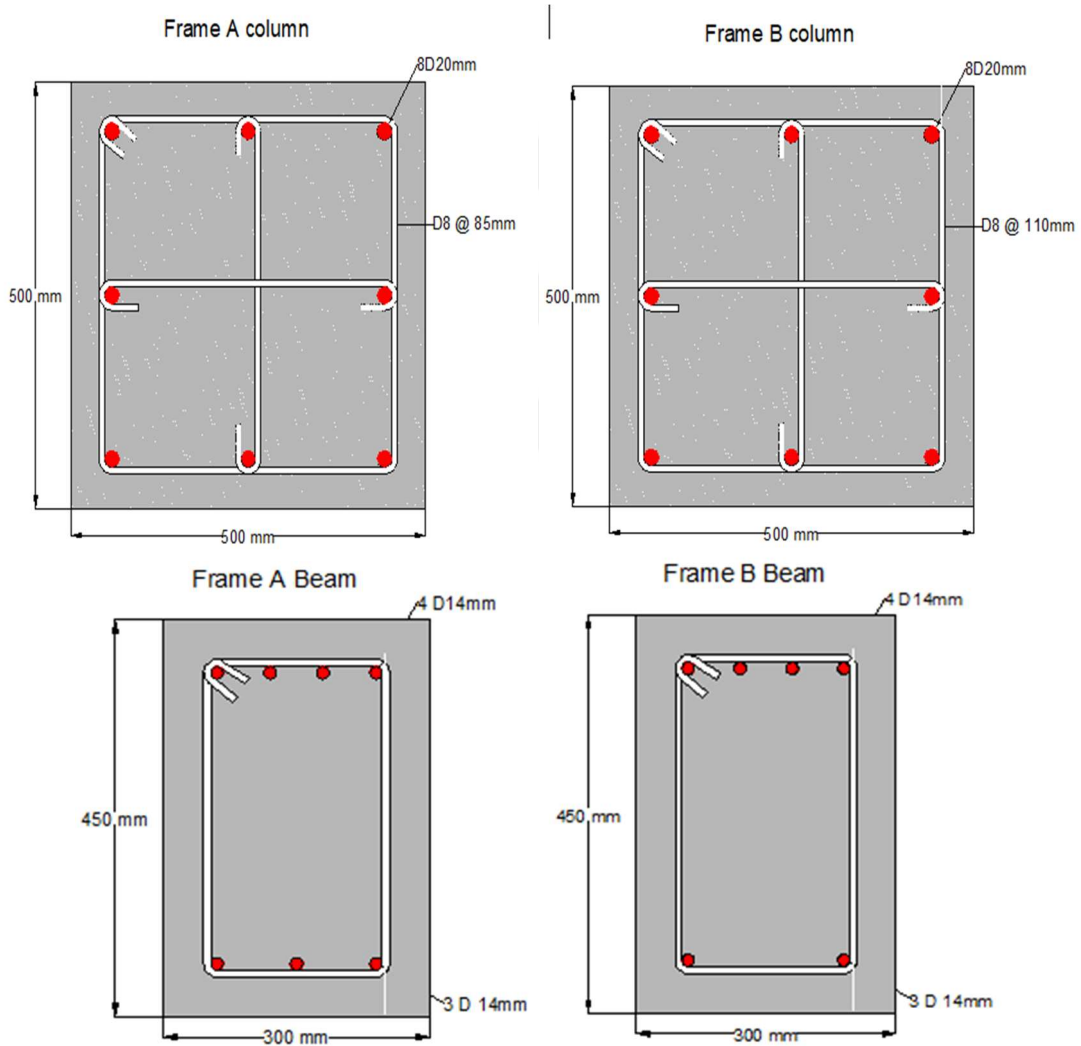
Reinforcement detailing of the reinforced concrete members.
